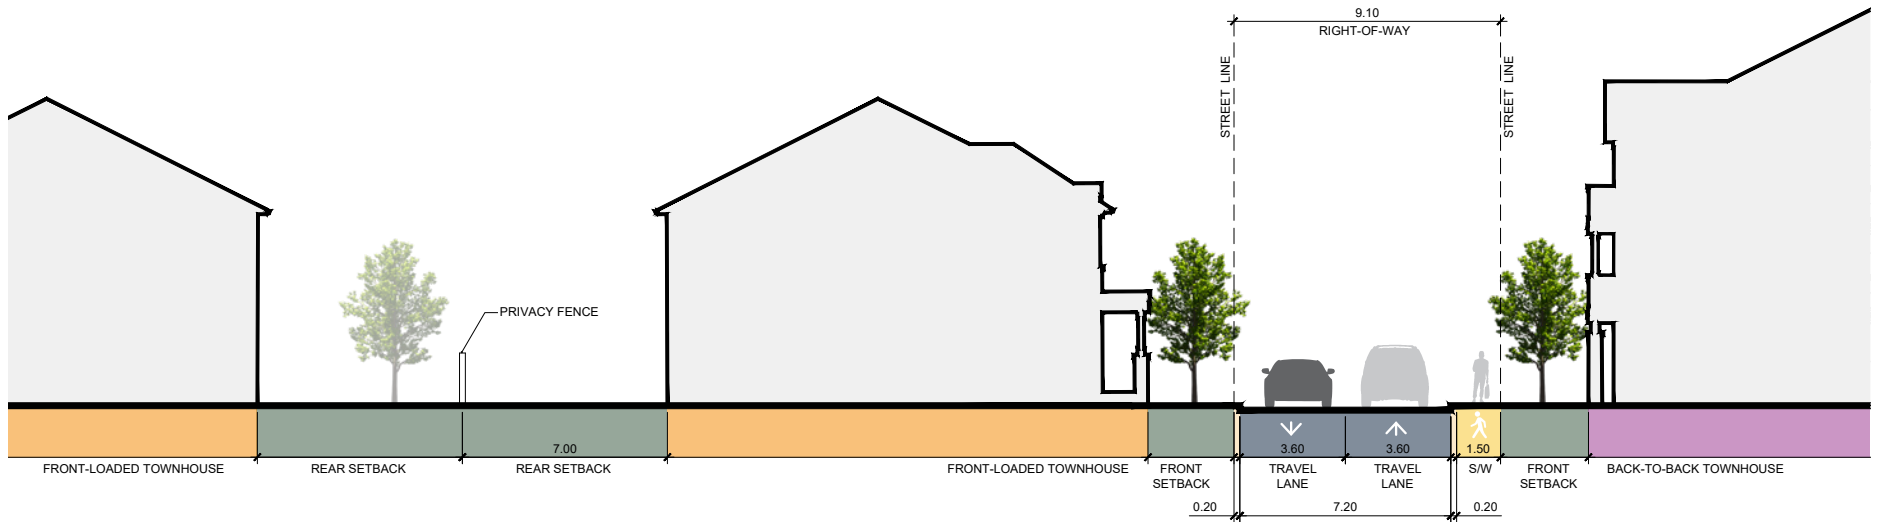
D-D' 9.10m Laneway ROW Cross Section
